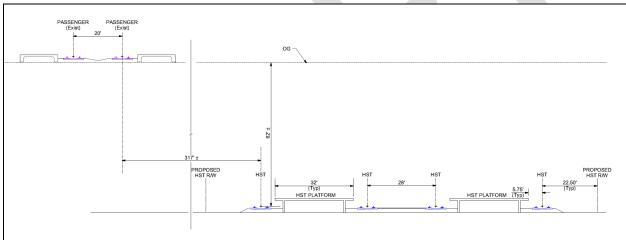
Typical Cross-Section – ARTIC – Underground HST Station Option
